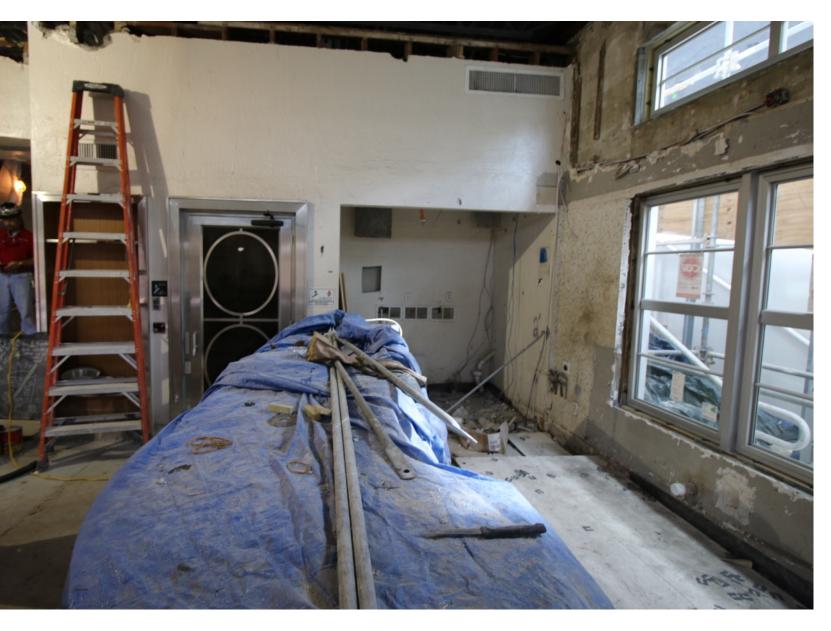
PHOTO BELOW: FORMER LOCATION OF OPEN STAIR TO BE SECOND FLOOR CAN BE SEEN BY OUTLINE OF TILE BASEBOARD ON WALLS.
